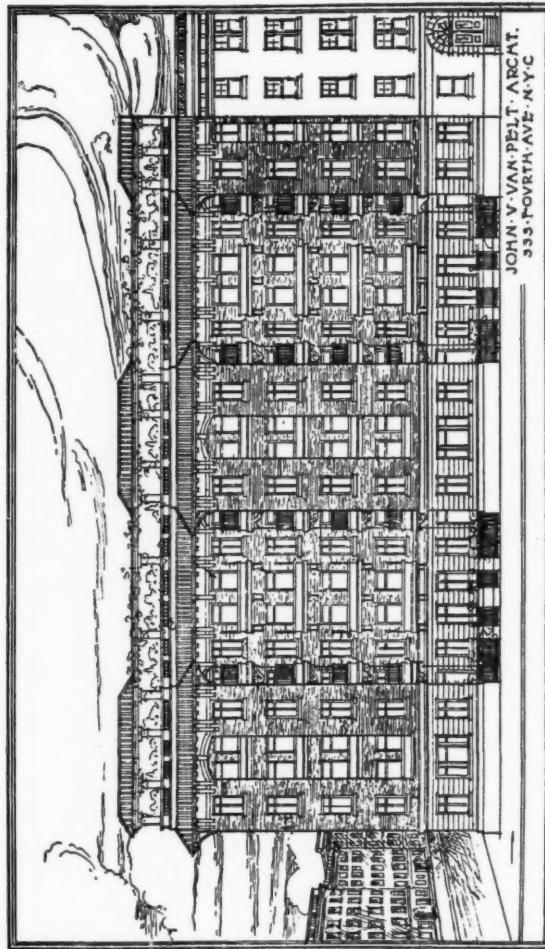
ELEVATION OF OPEN-AIR MODEL TENEMENT HOUSE.
